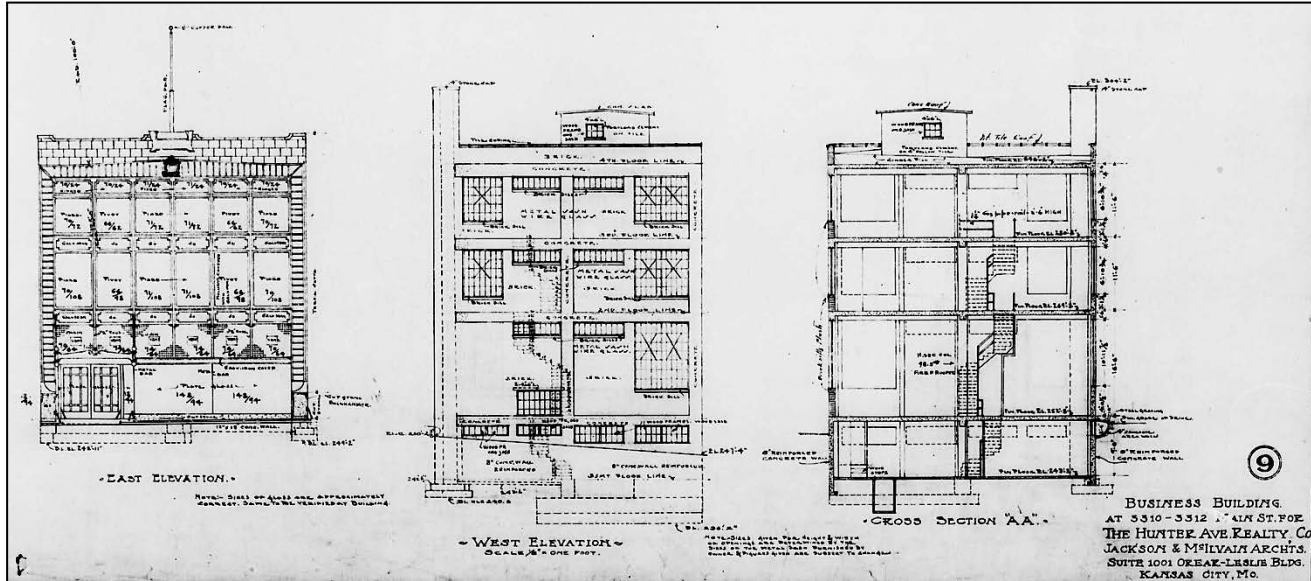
Original architectural drawings, east and west elevations and cross section, 1911.
